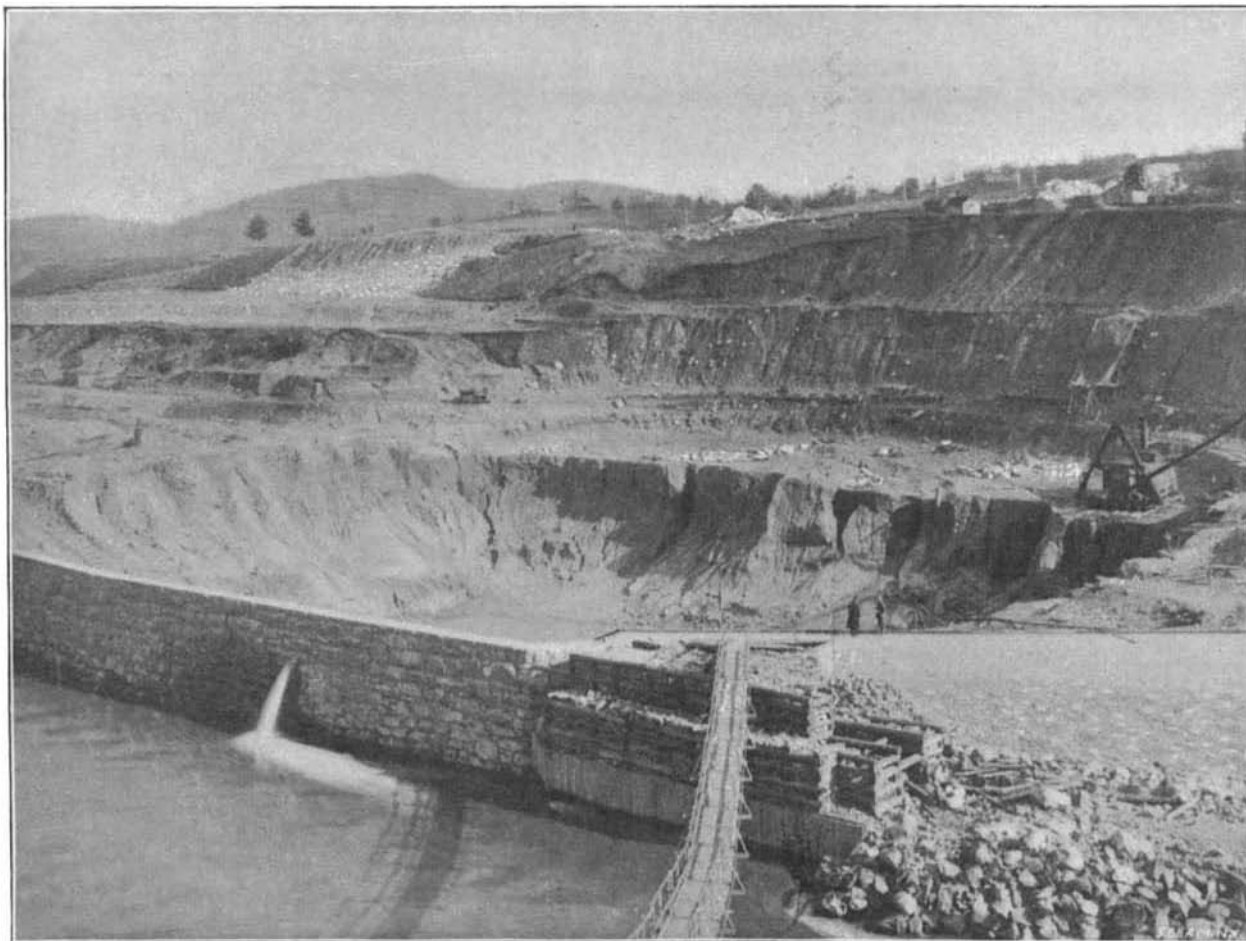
Excavation, 130 Feet Deep, for the Dam Foundation.
